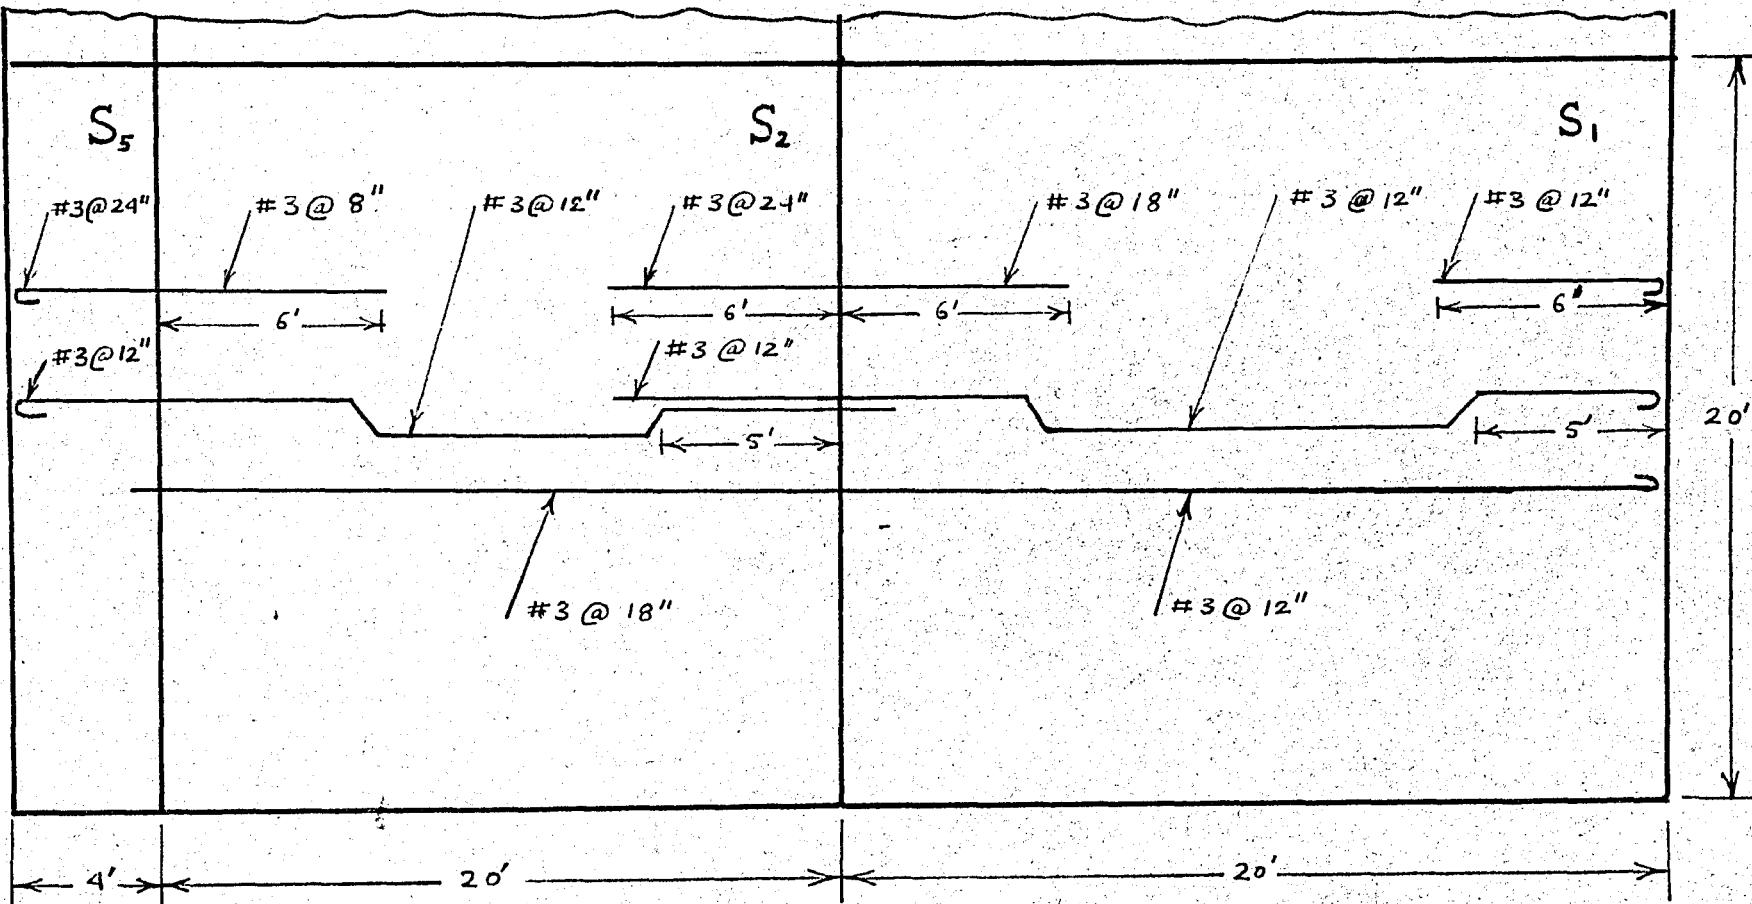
S_1 , S_2 , and S_5 Steel Reinforcement
